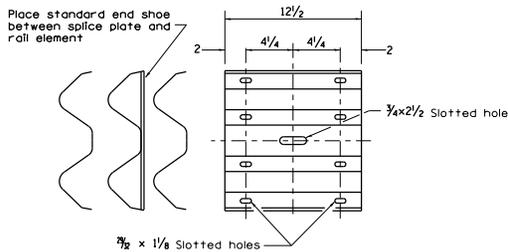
Plate A shall be placed between rail element and block-out at non-splice mounting points only when steel block-outs are used.
